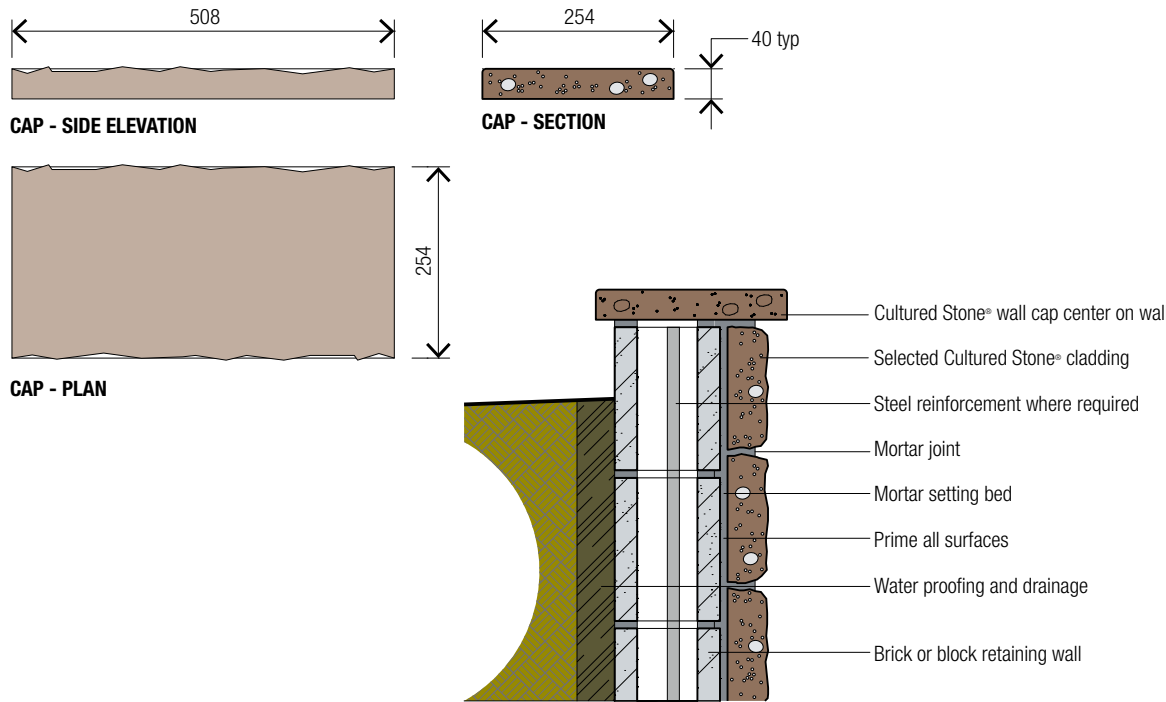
Retaining Wall - Section (Dwg # CS-10.01)
